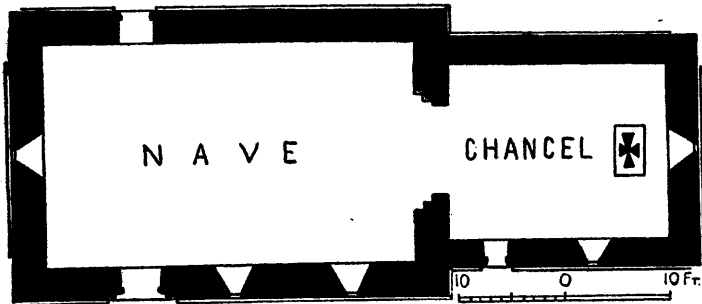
PLAN OF CRUGGLETON CHURCH.
